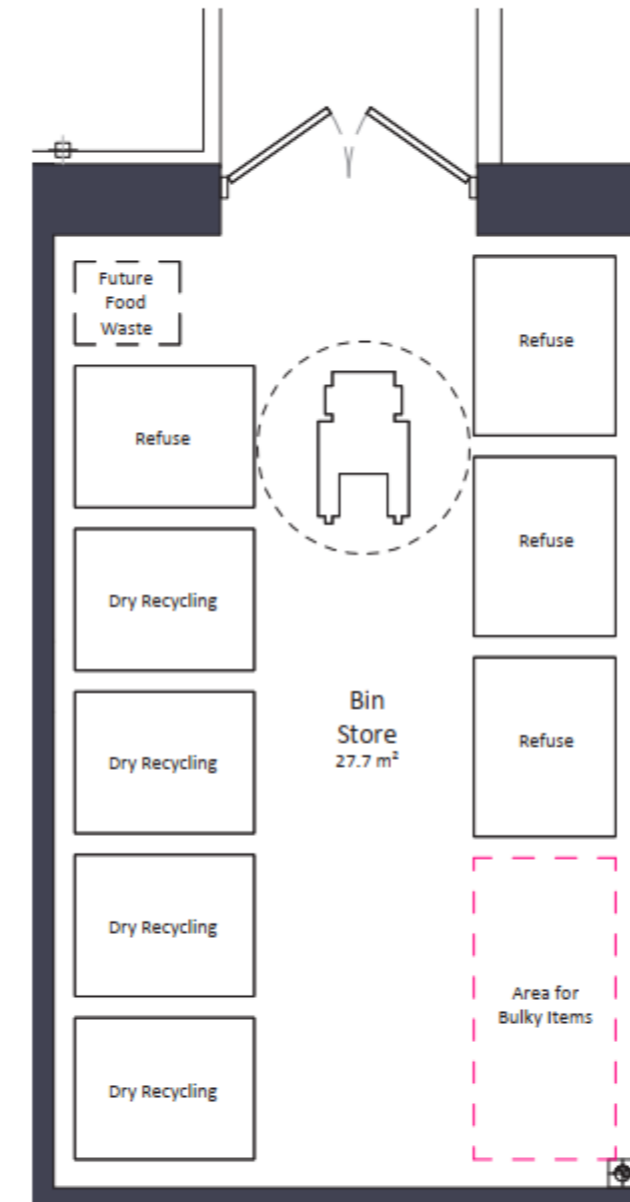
Design and Access Statement, Section 4.7.4 detailing waste storage provisions for typical houses and flat blocks, showing suitable waste segregation in accordance with LBRuT requirements
